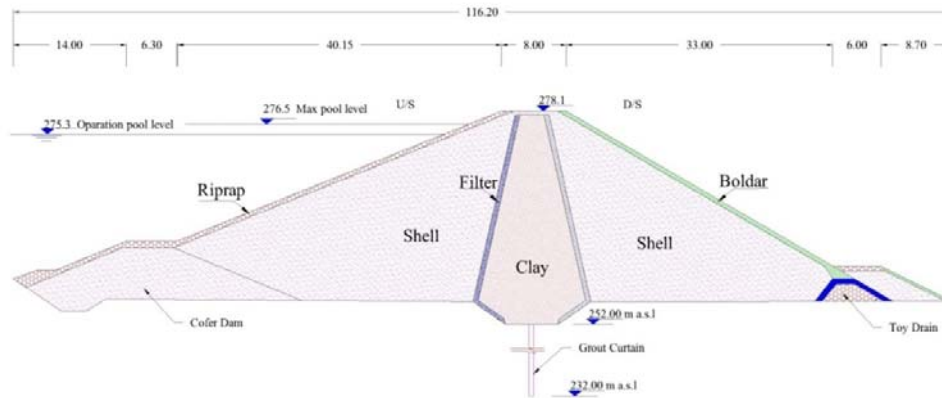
Cross section of Bawashaswar zoned earthfill dam.
